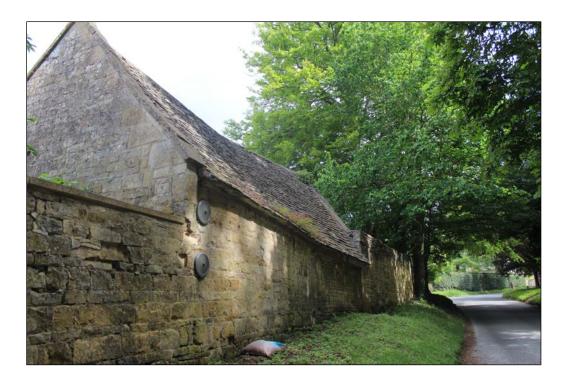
East elevation of south garage, view to the north, showing metal ties
